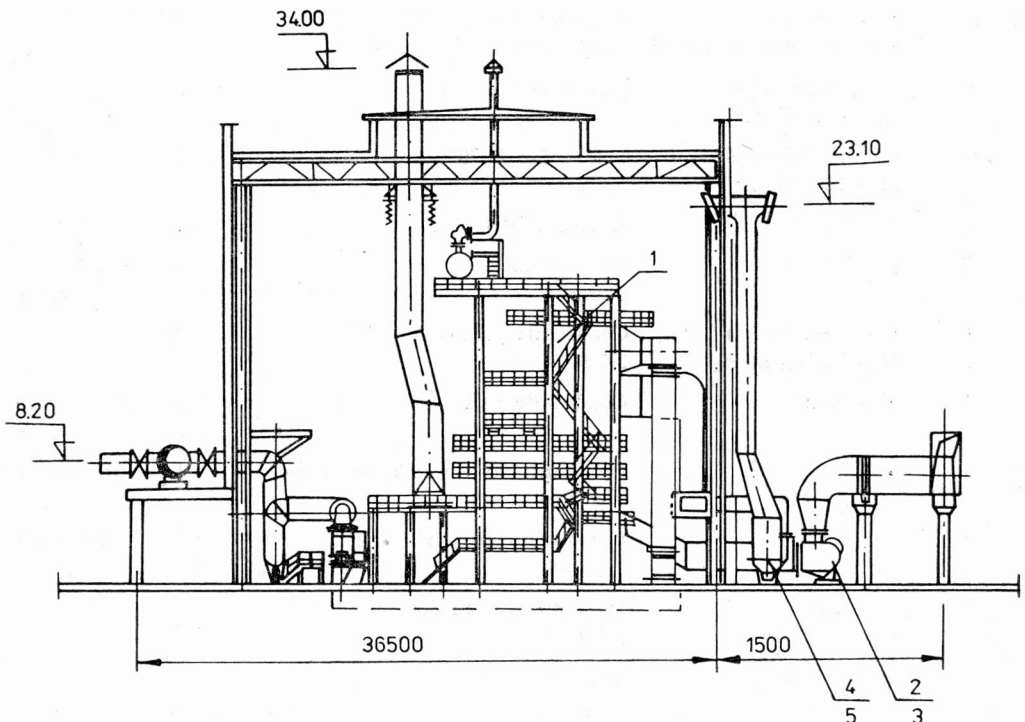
Enclosed arrangement of the boiler plant equipped with PKK-75/24 steam generators, side view
